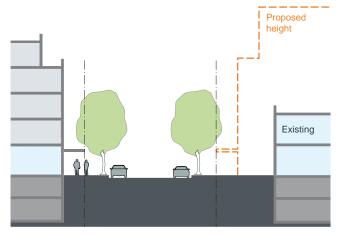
B.3 Section showing the building envelope and scale of the proposed development in relation to the street
